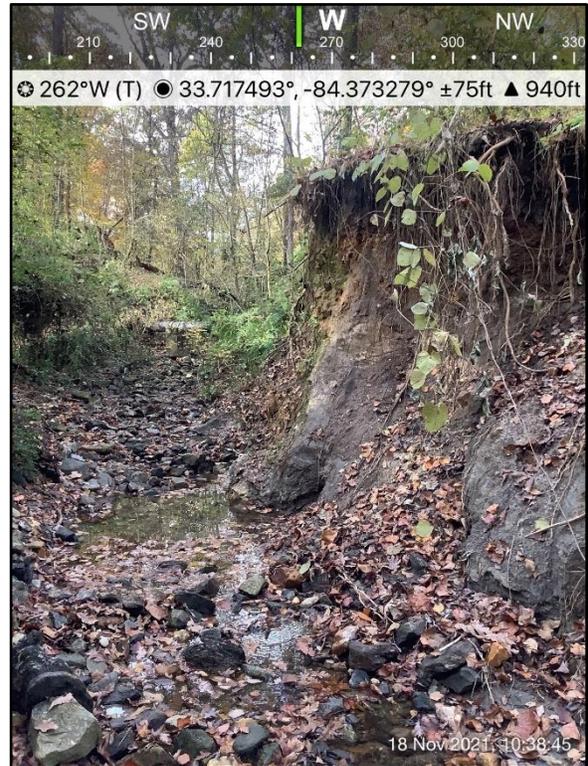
Concrete pipe protection over sanitary sewer line at large headcut along Stream 1 at approx. Sta. 4+70
